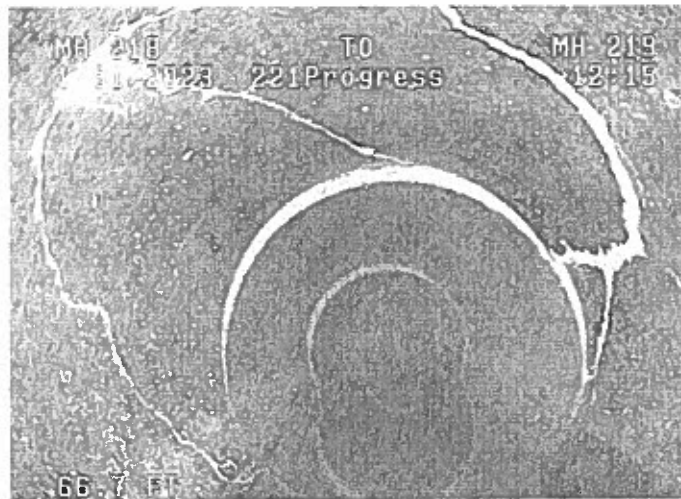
Progress Street - Sewer Main Cracks (66.7')
